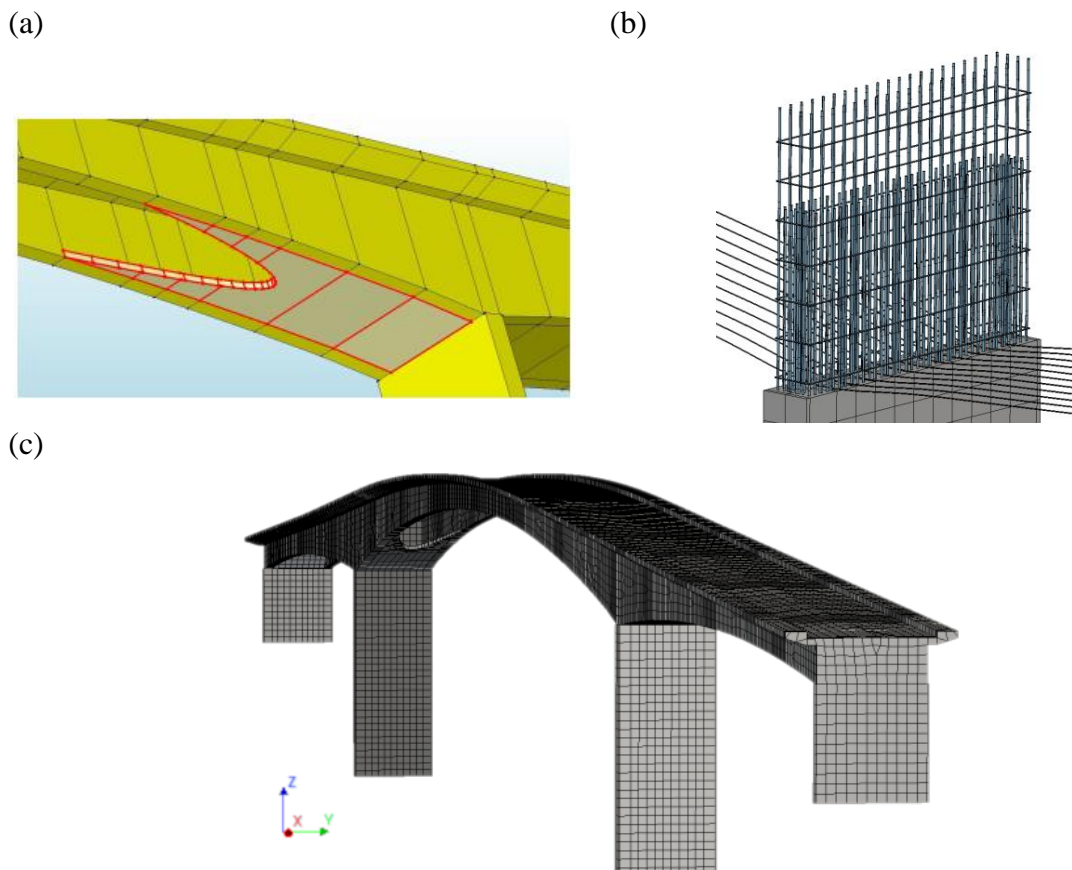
Numerical model of the Herøysund Bridge. (a) Detail of geometry near the columns. (b) Detail of the reinforcement of the columns. (c) Mesh of the full model
